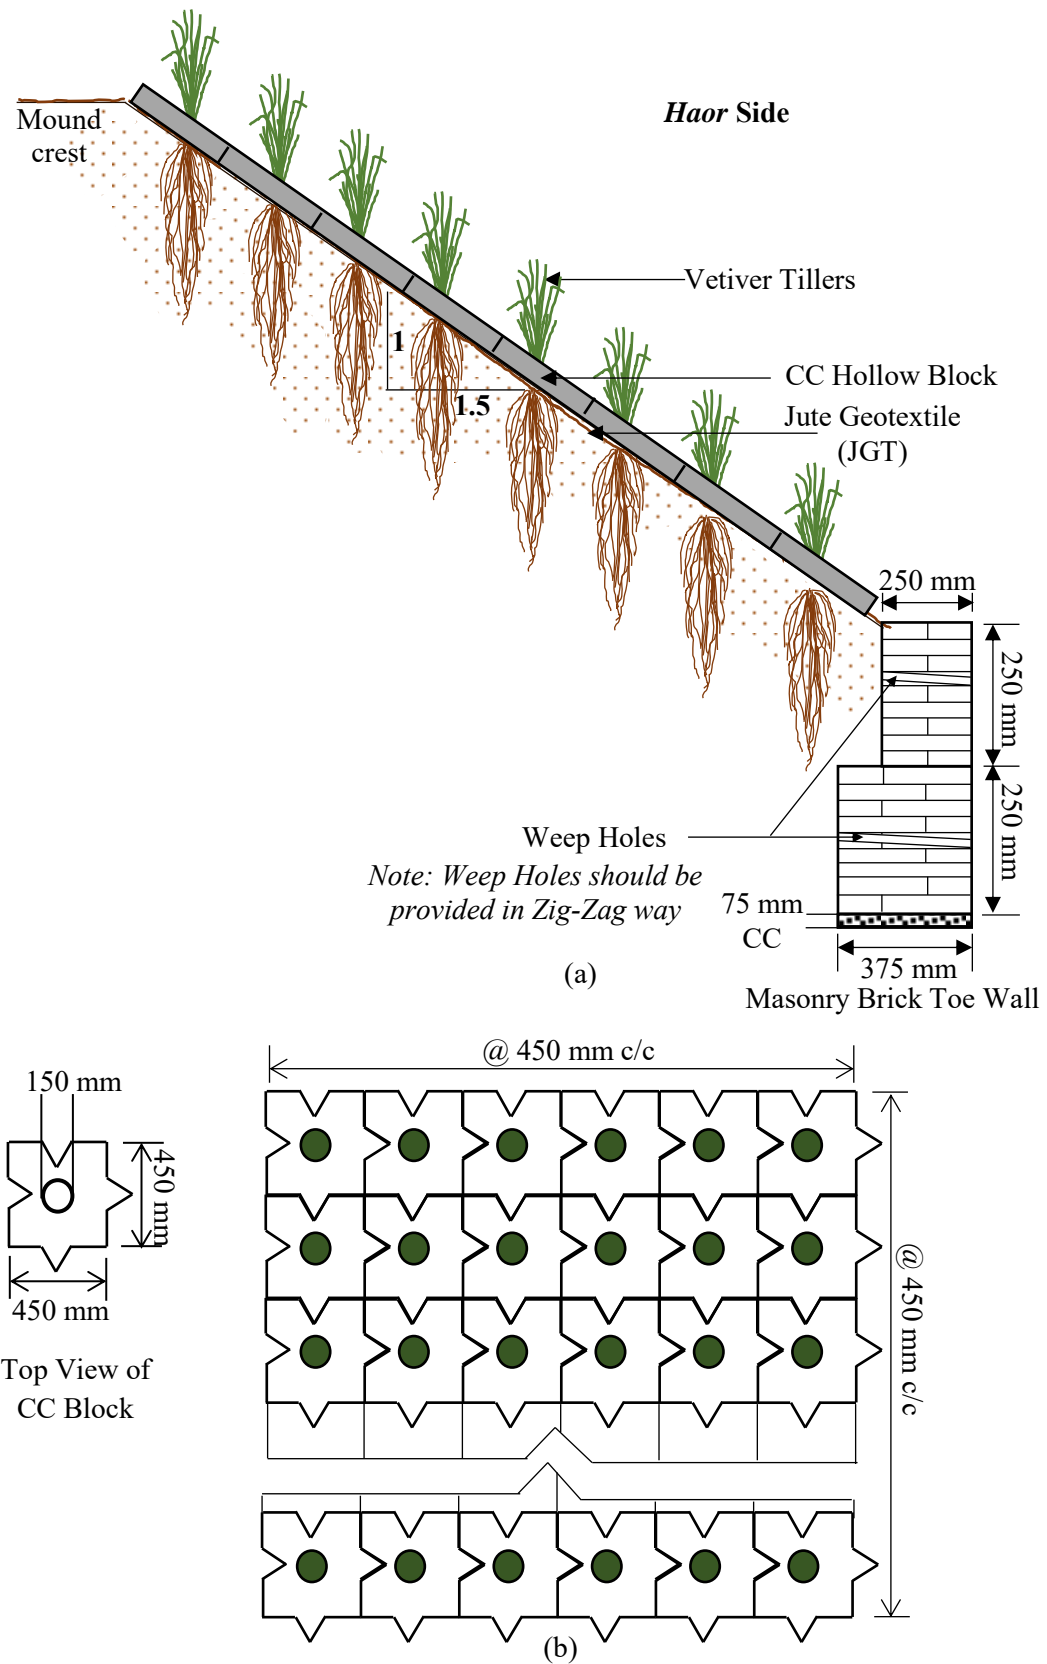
Schematic Drawing of Design Type III, (a) Cross Sectional View; and (b) Plan View (Redrawn from Islam, 2019)
